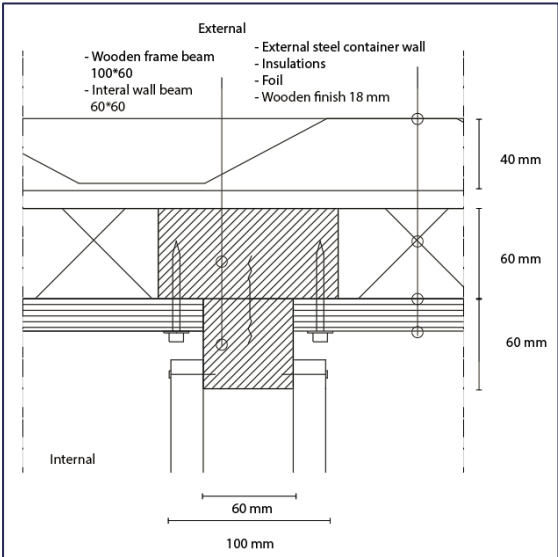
; Detail 2; horizontal section of inner wooden structure with inner wall
